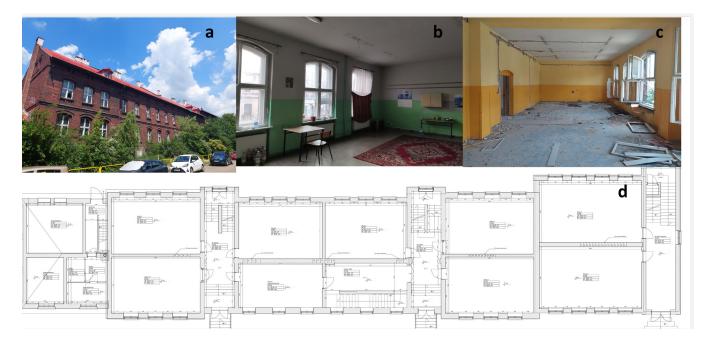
Case project: (a) exterior view credited to Krzysztof Skrzypiec, (b) interior 2nd floor credited to Jakub Świerzawski, (c) interior 1st floor credited to Krzysztof Skrzypiec, (d) ground floor plan
